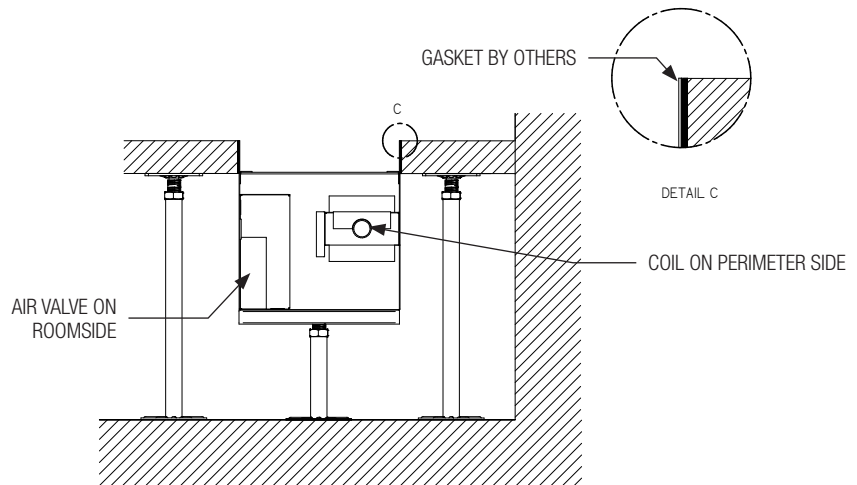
LNT FLANGELESS PLENUM FRONT VIEW
